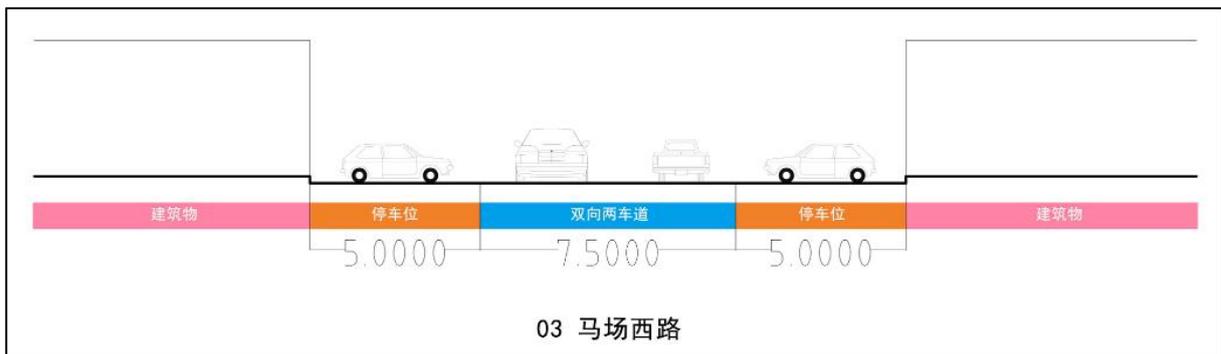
Machang West Road road section Resource: Self-drawn by the author
